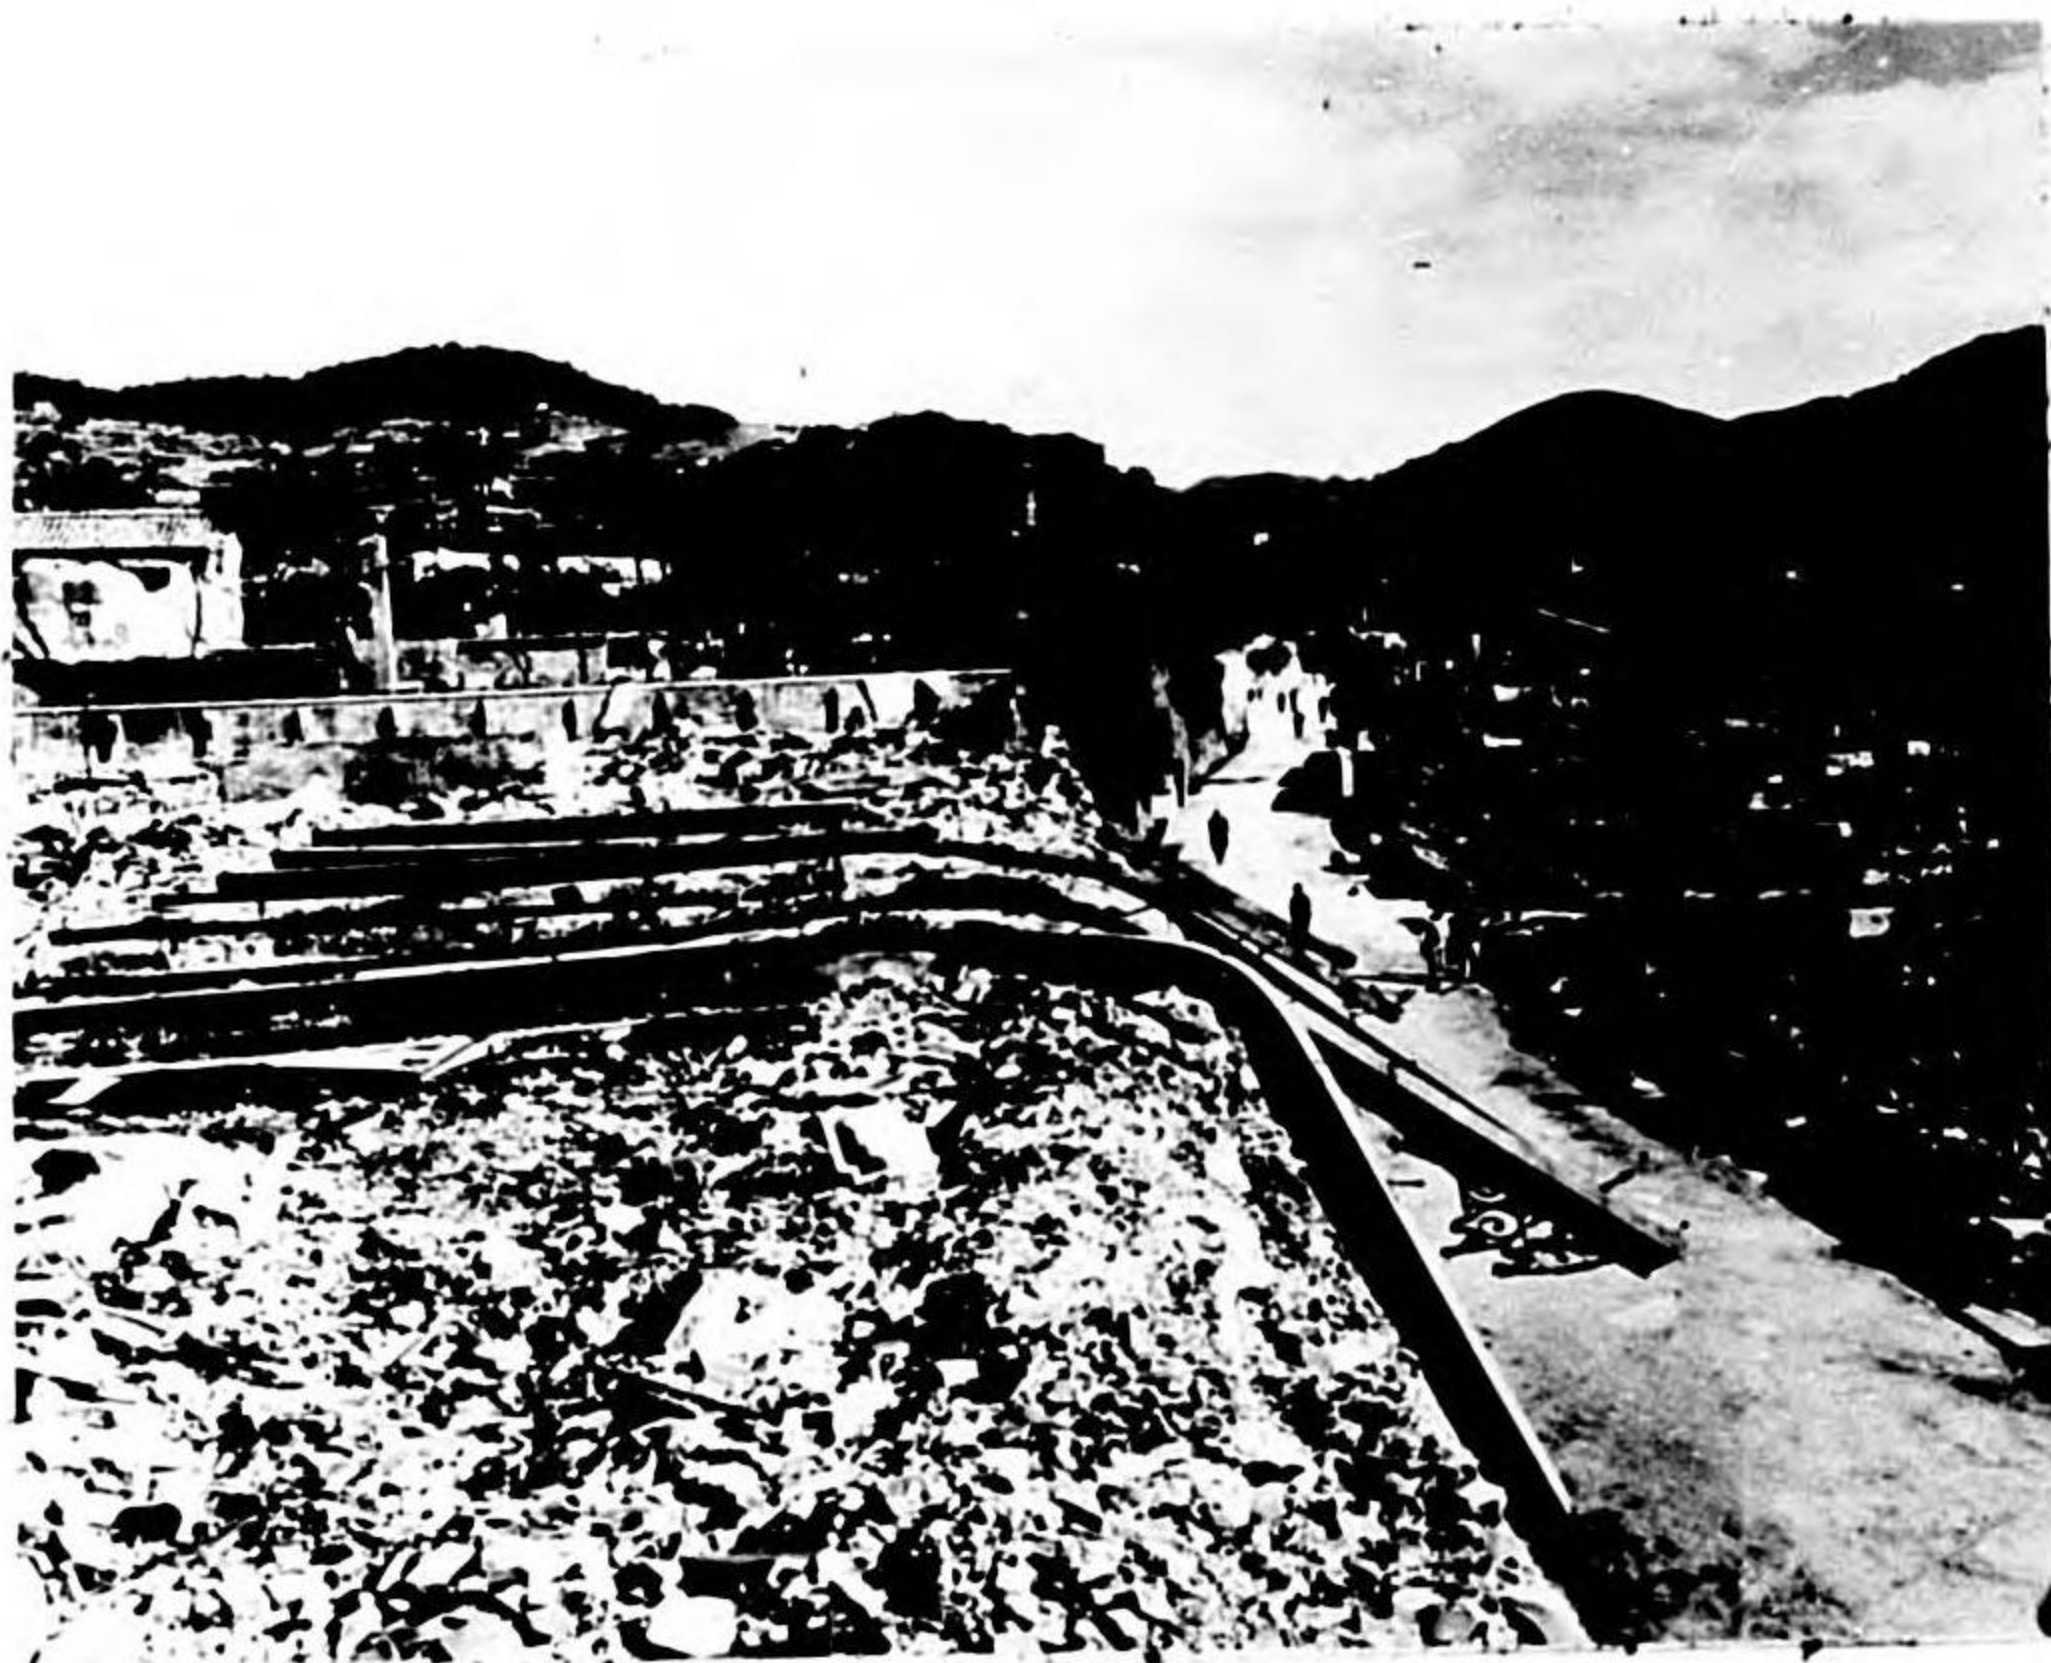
Nagasaki. Area 10,000 feet from GZ. Fire damage. Buckled I-beams.
